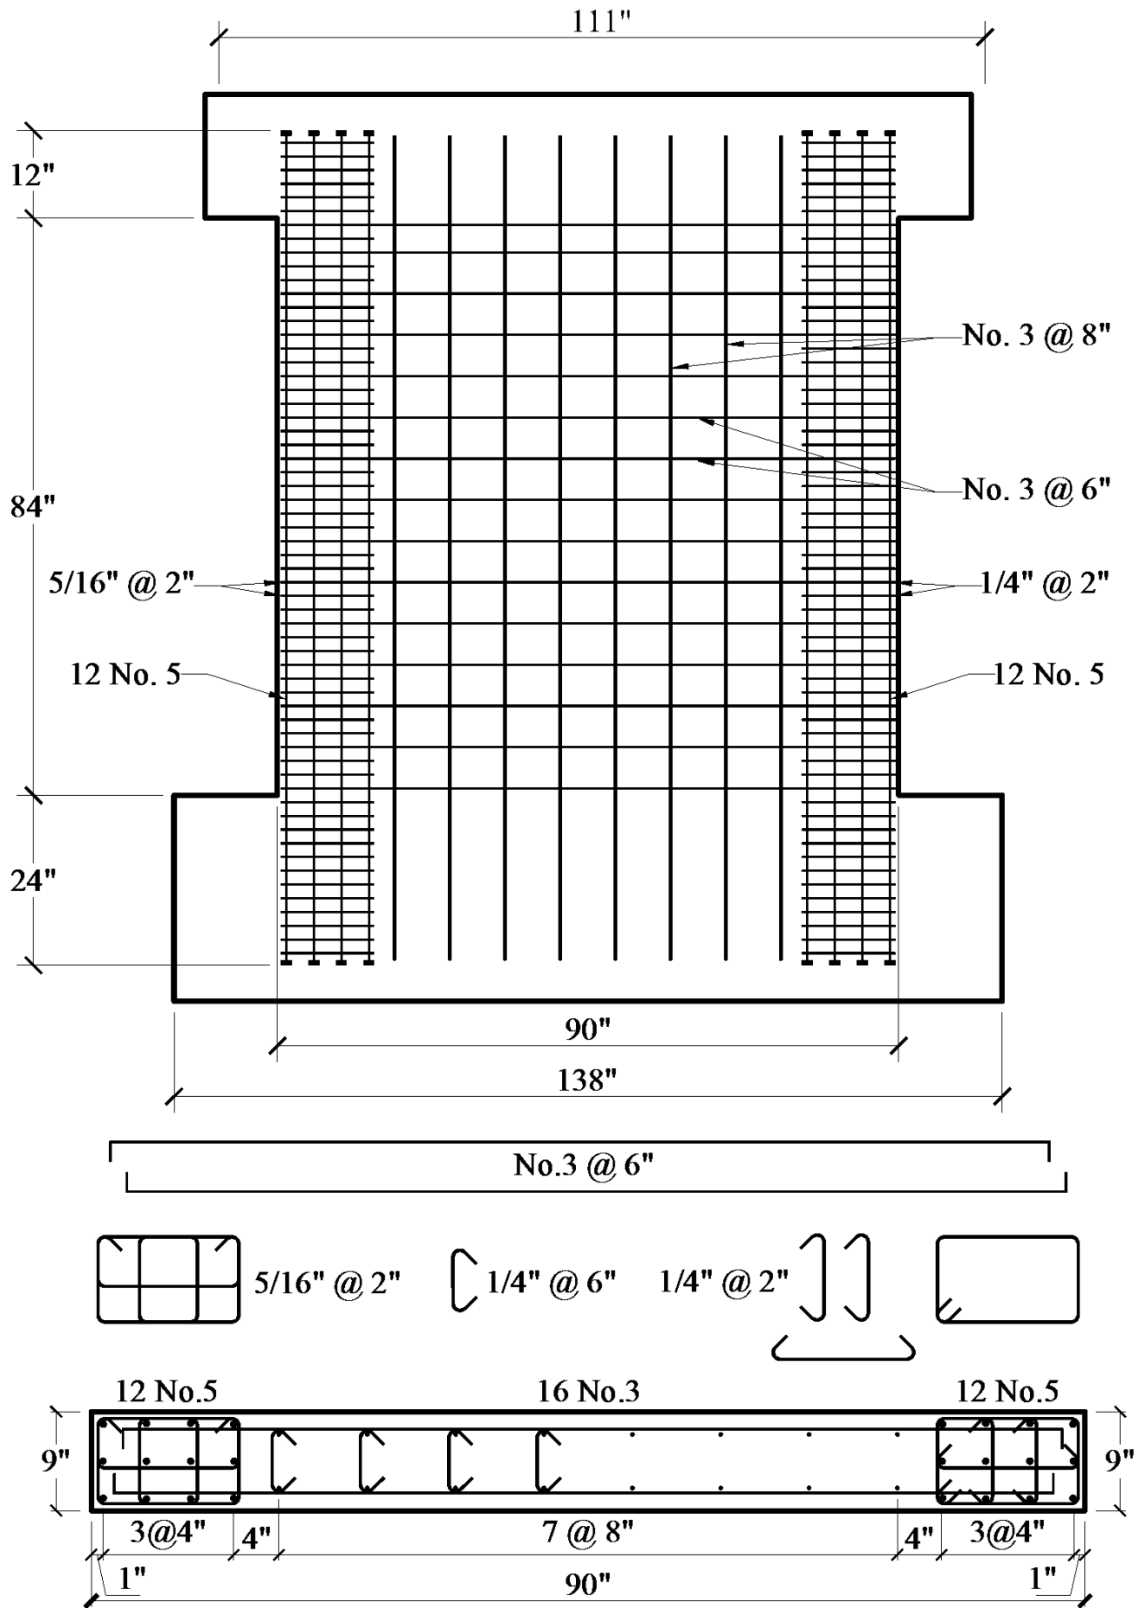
Specimen WP7 reinforcement (Conversion: 1"=25.4 mm)
